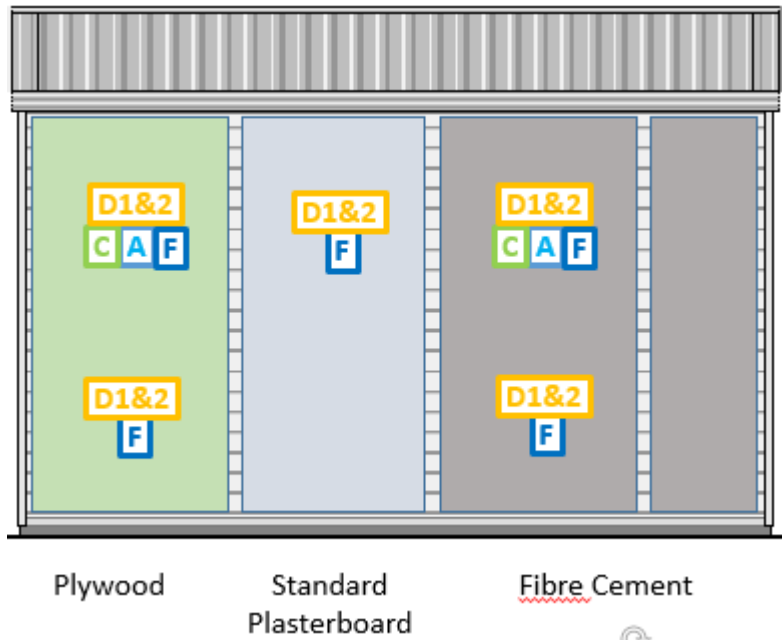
Experiment #1 general layout of devices in non-rated long wall
